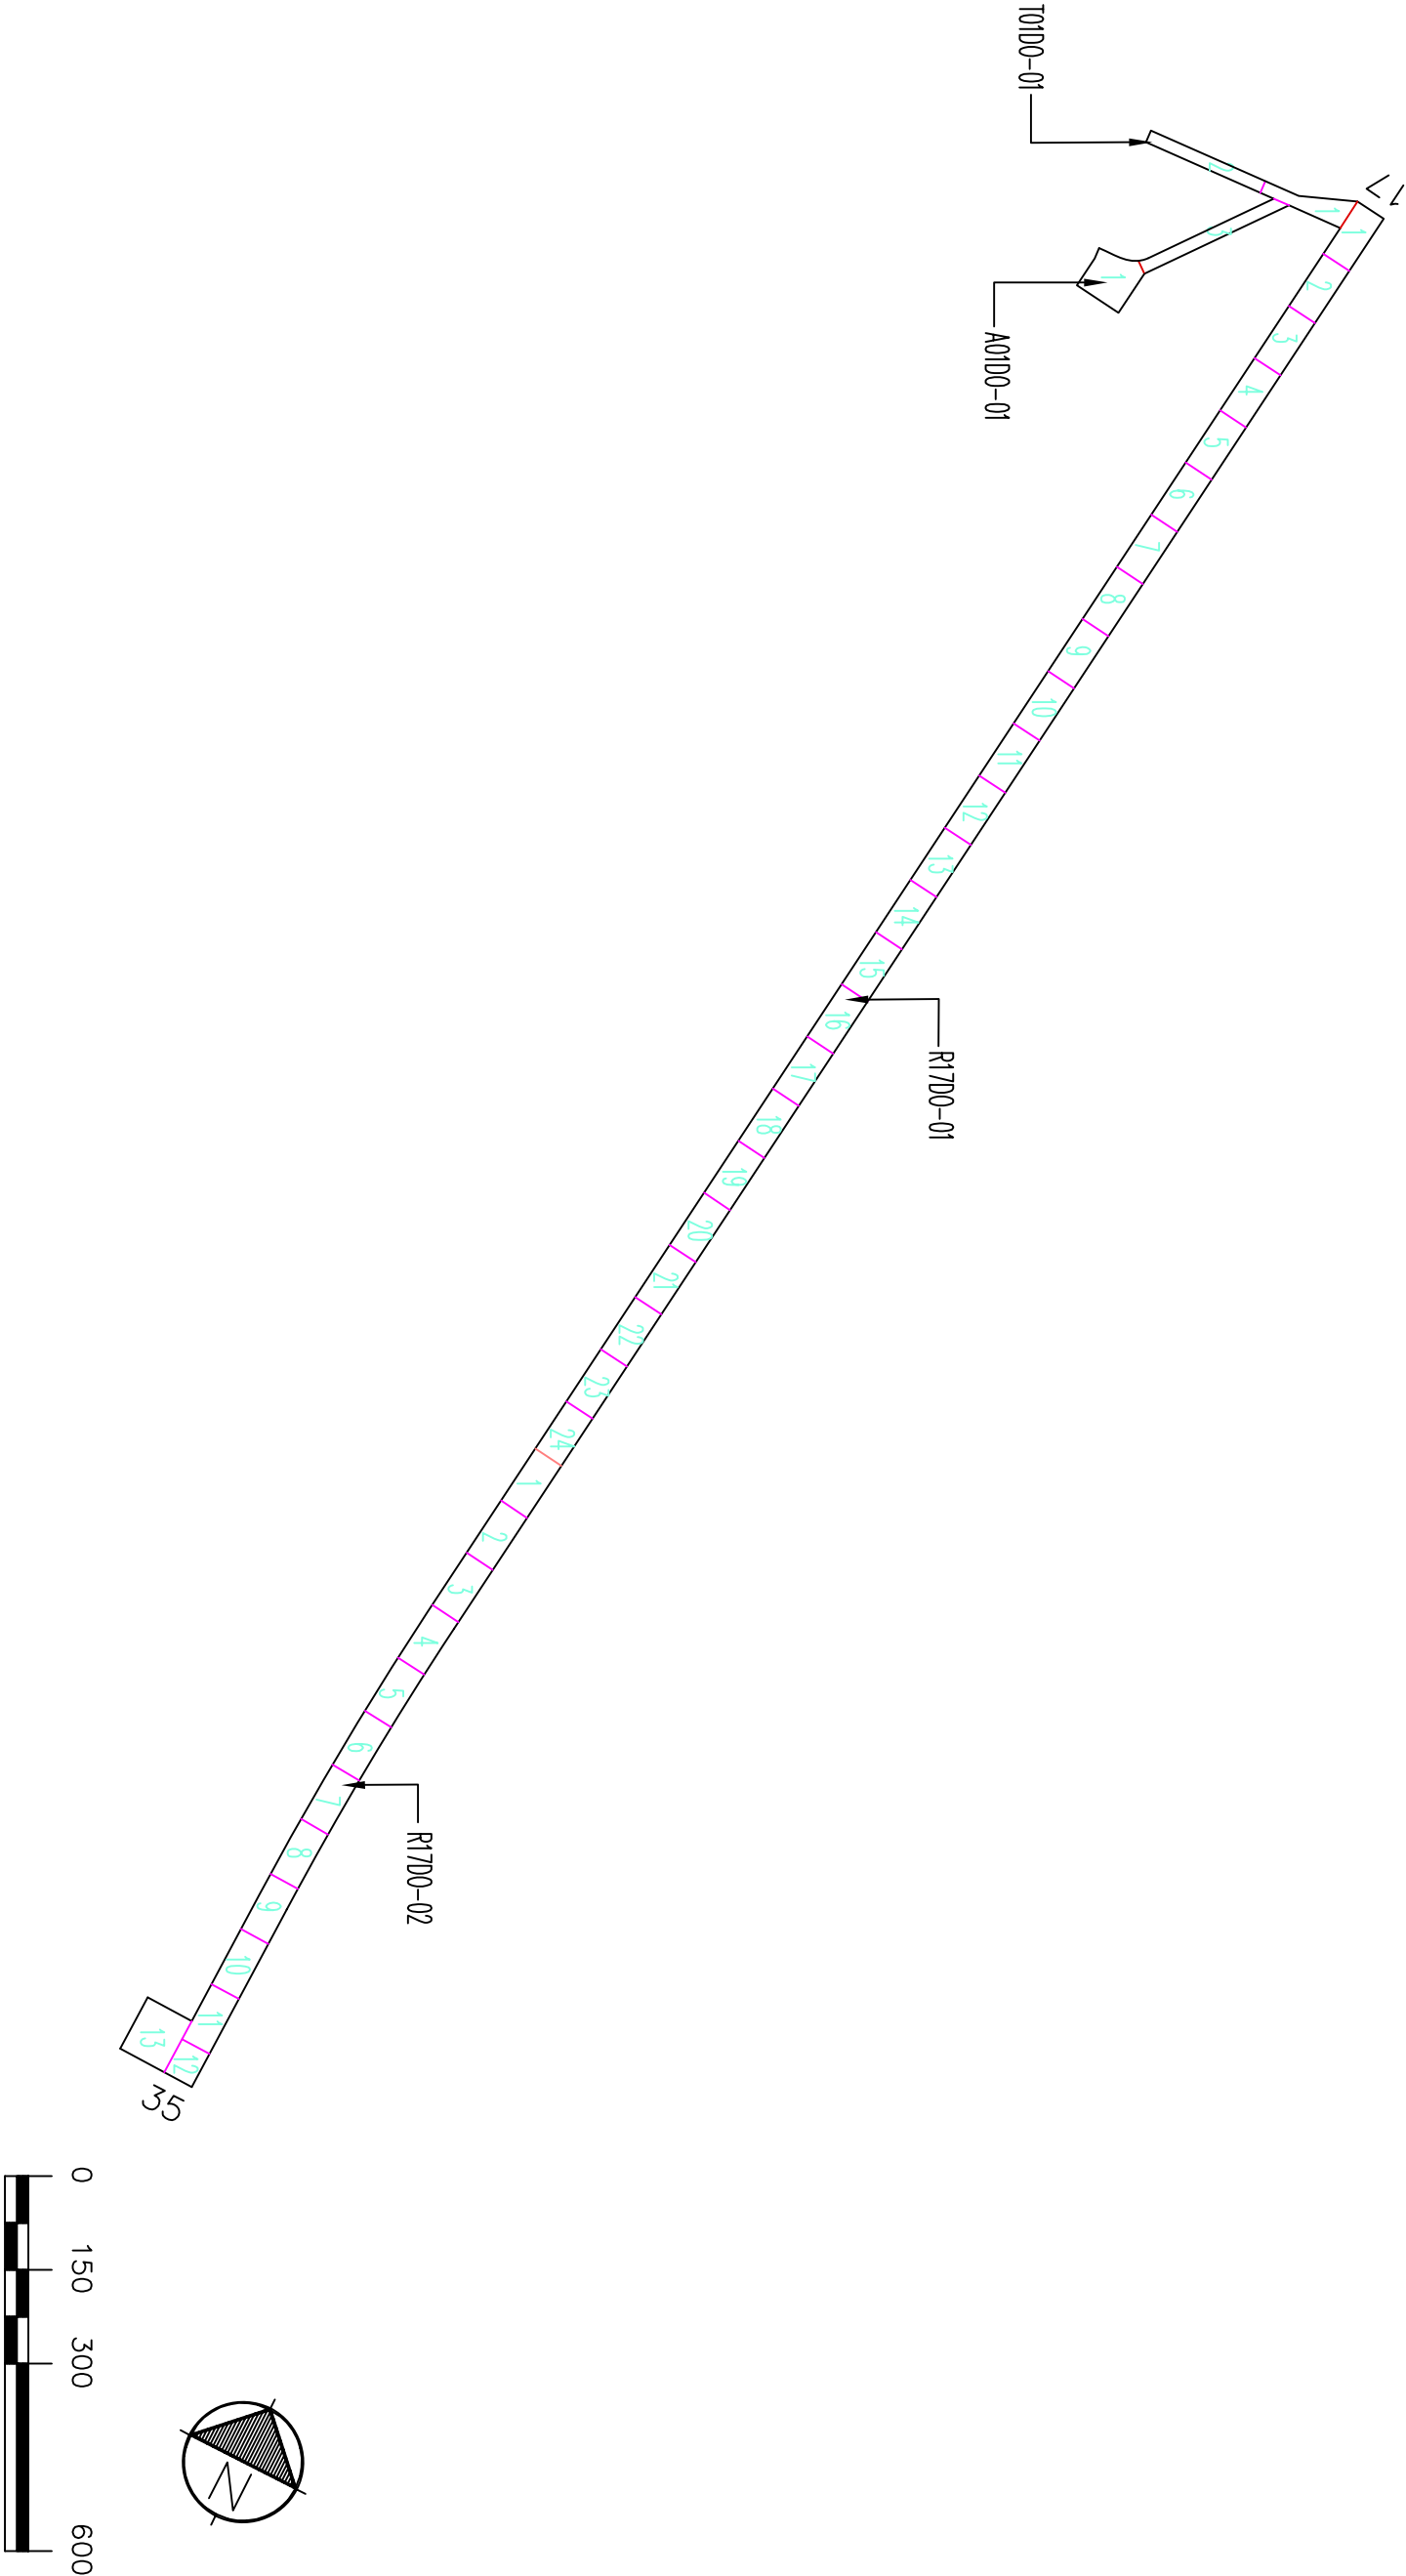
Pavement Branch, Section and Sample Unit Layout.
